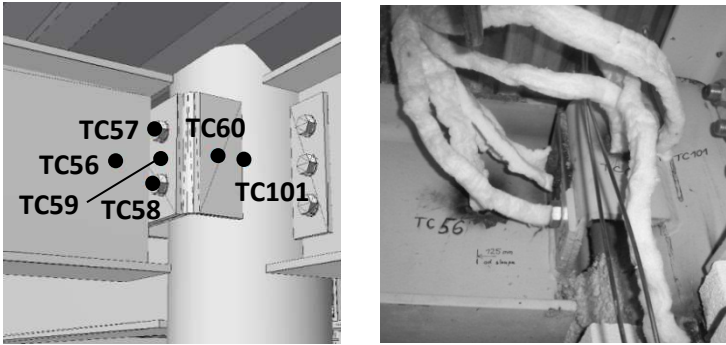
Fire unprotected beam-to-column connection (A2-B2 to B2) in the 1st floor
